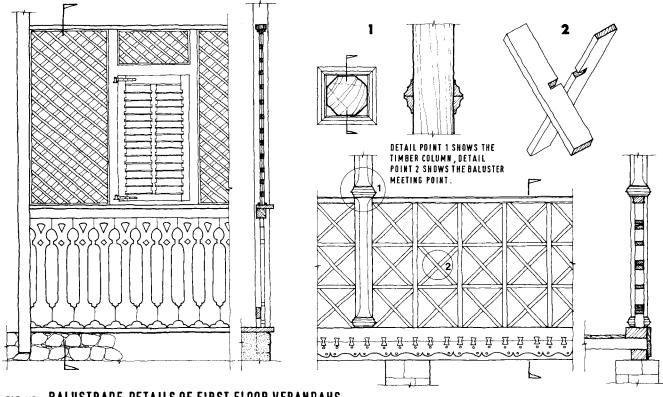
BALUSTRADE DETAILS OF FIRST FLOOR VERANDAHS IN ABETIFI AND OBOMENG
